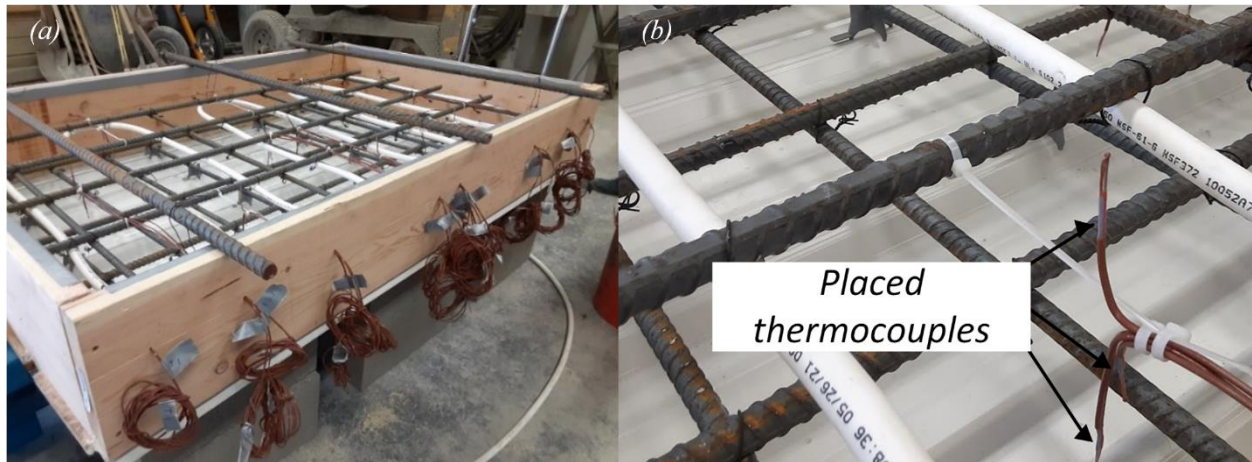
a) Completed form with thermocouples and b) closeup of placed thermocouple
